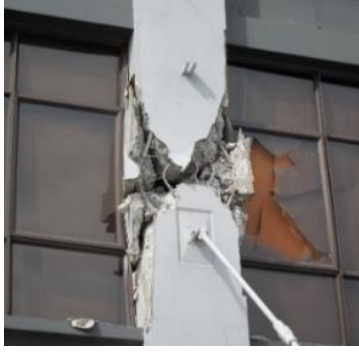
Shear damage in reinforced concrete walls
